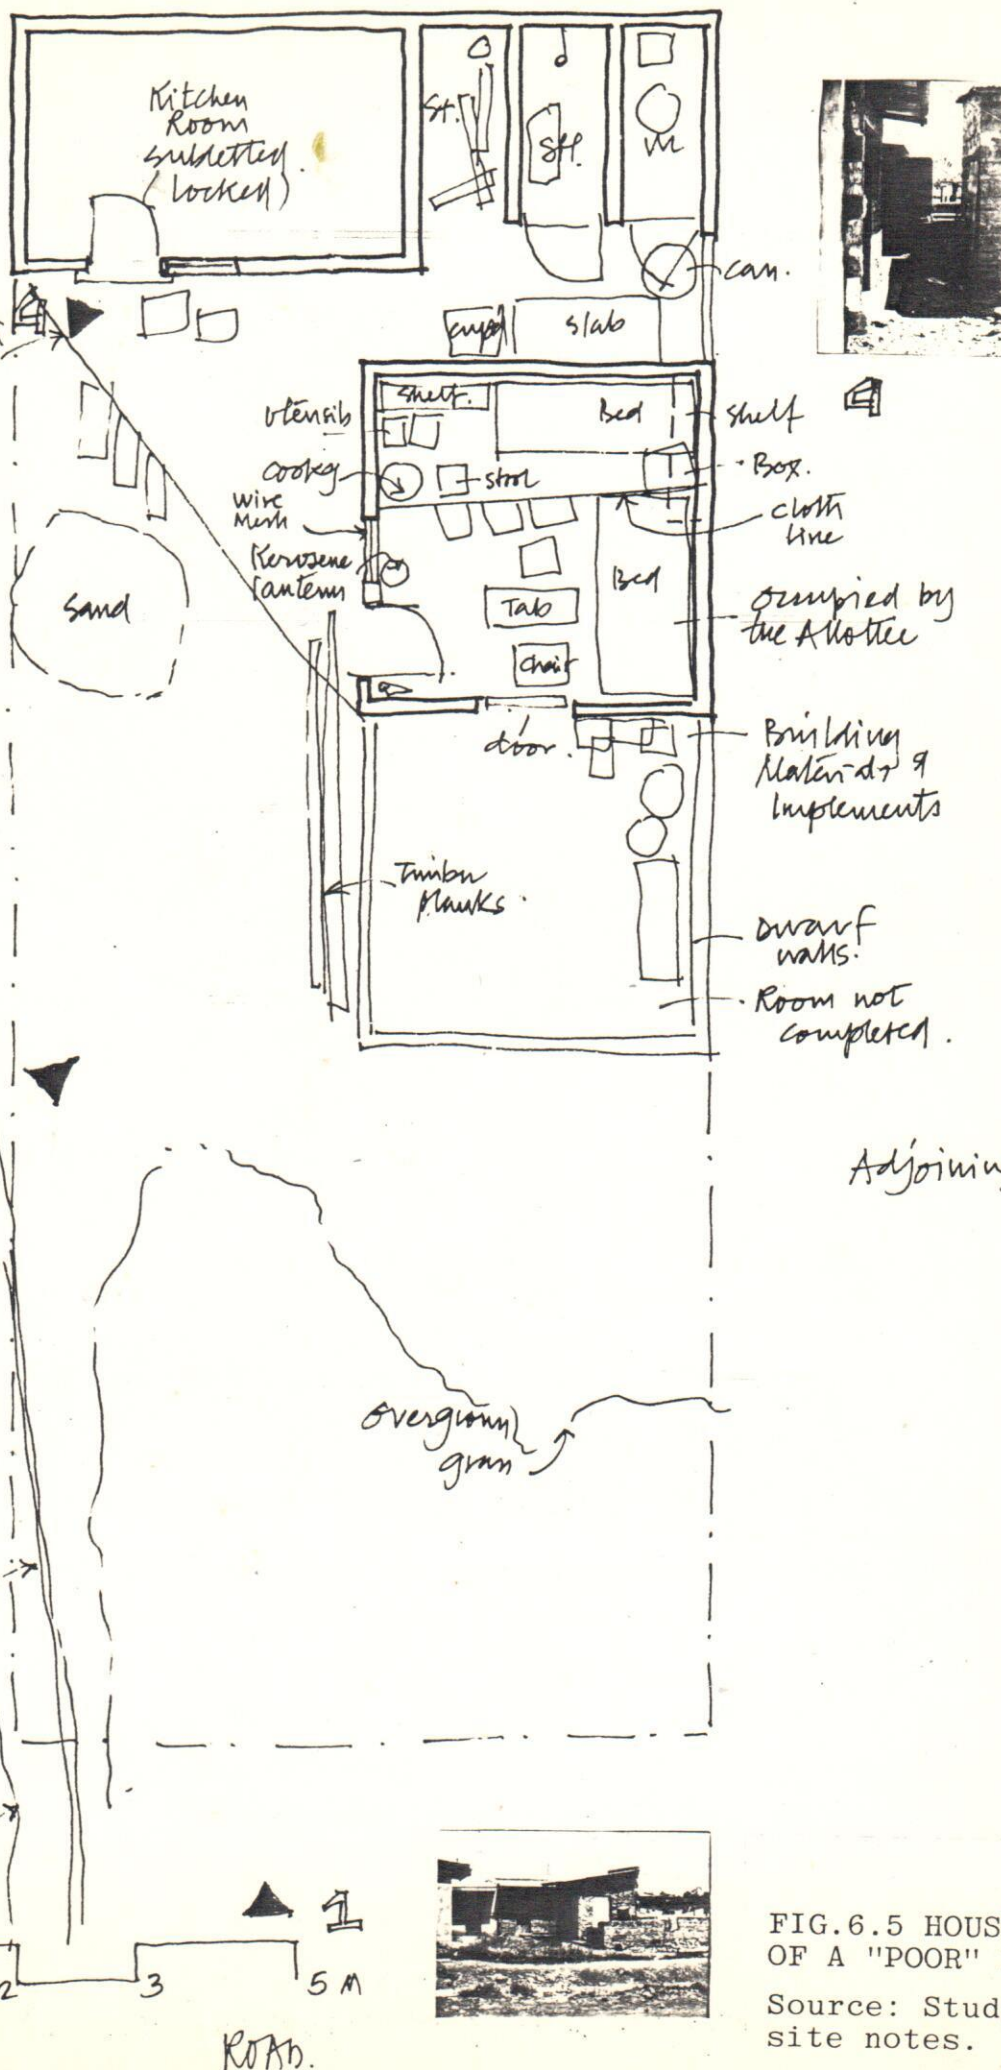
HOUSE LAYOUT OF A "POOR" DWELLING
